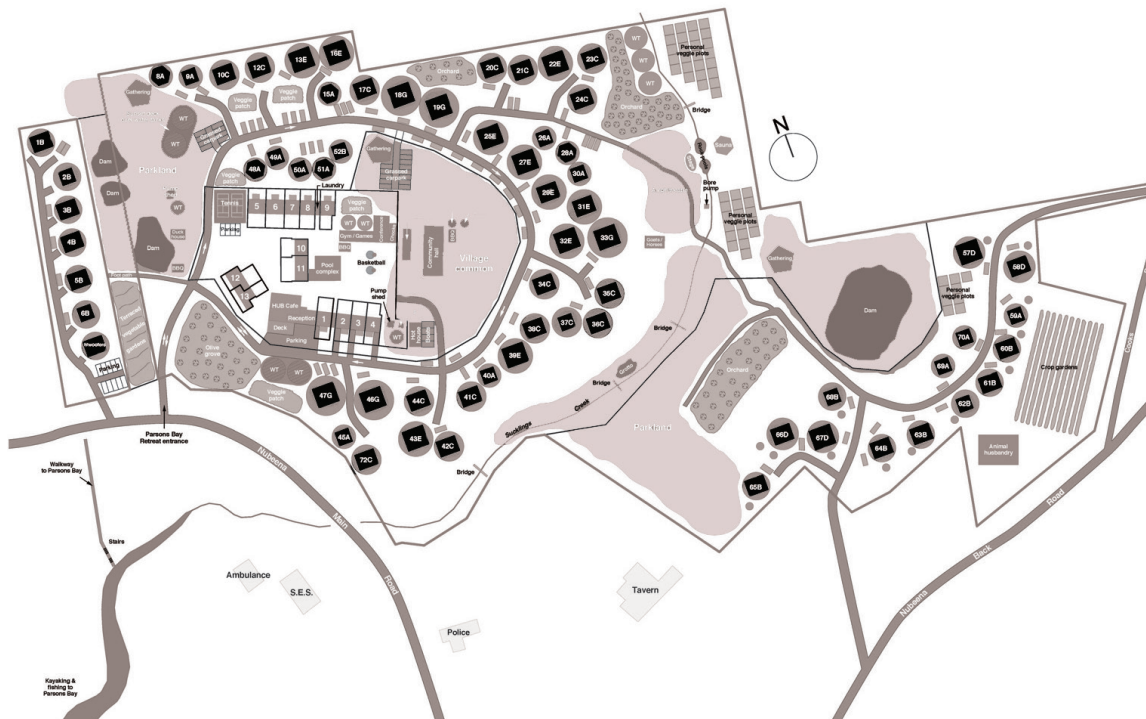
Master Plan V4, roads and driveway access to each seed.
